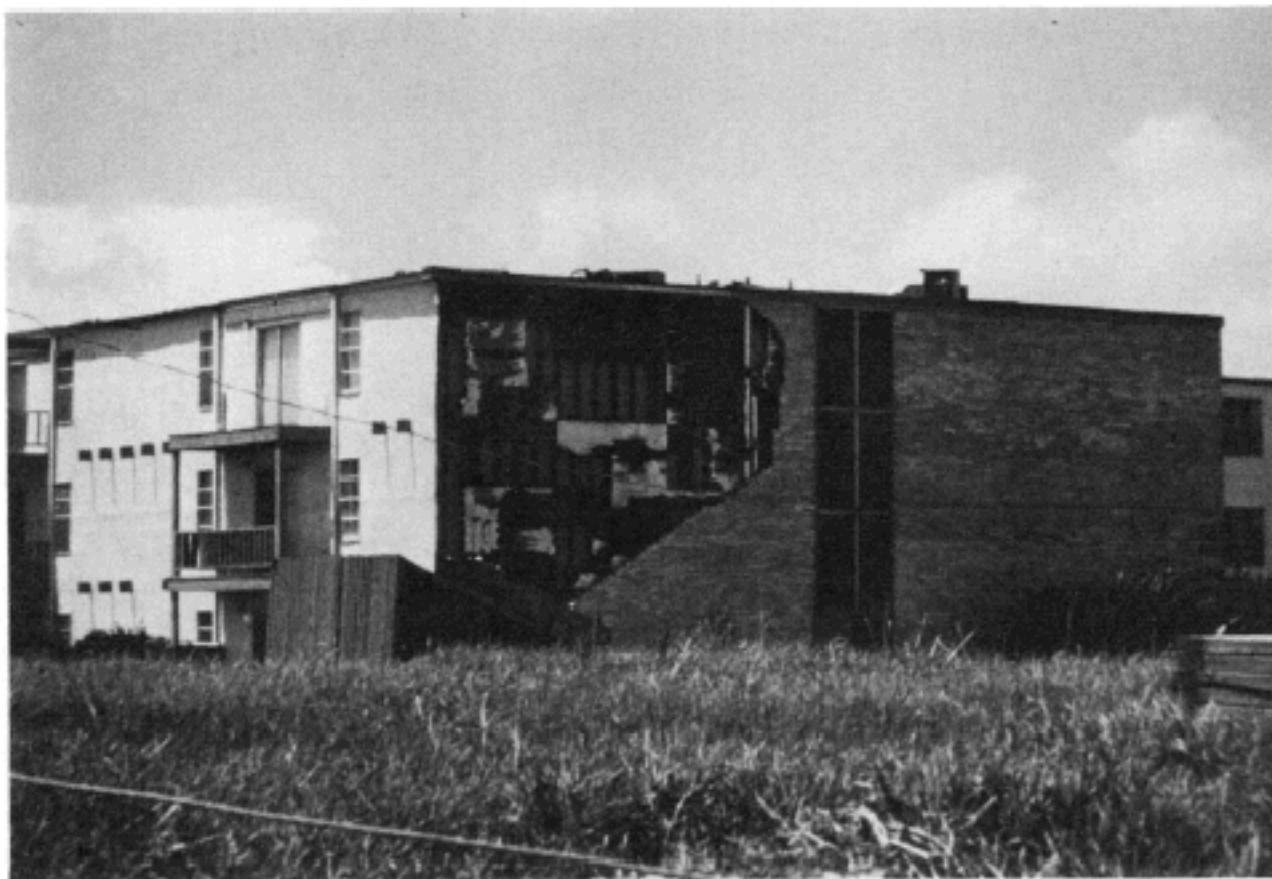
Failure of veneer brick walls due to lack of ties.
